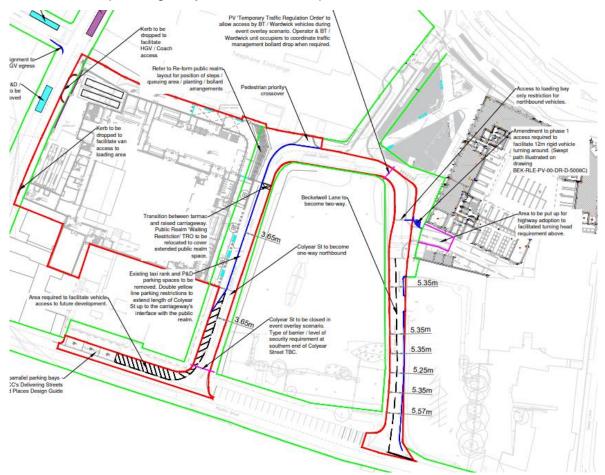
Proposed Highway Changes to Colyear Street and Becket Well Lane
